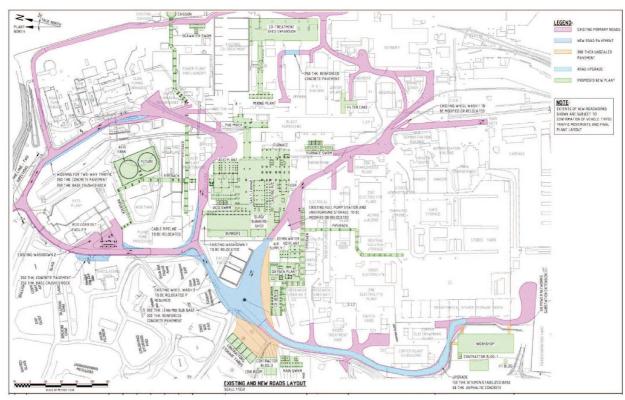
Nyrstar site - Proposed Development Concept Plan Layout - Original Assessment Report.
